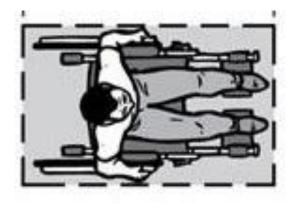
Plan view showing an outline of a clear floor space of 80 cm by 135 cm
